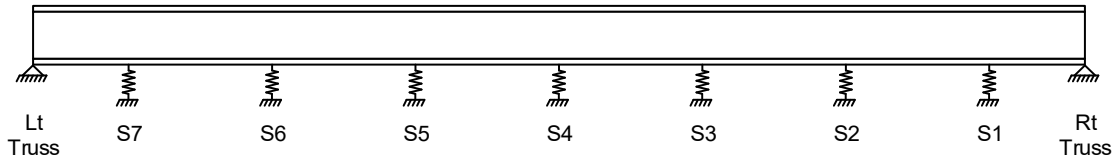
Modeling the Stiffness of Stringers as Springs Connected to a Floor Beam
